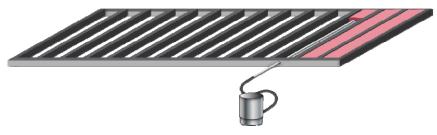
Insulating floor cavity from the side where the floor joists run crosswise to the mobile home
